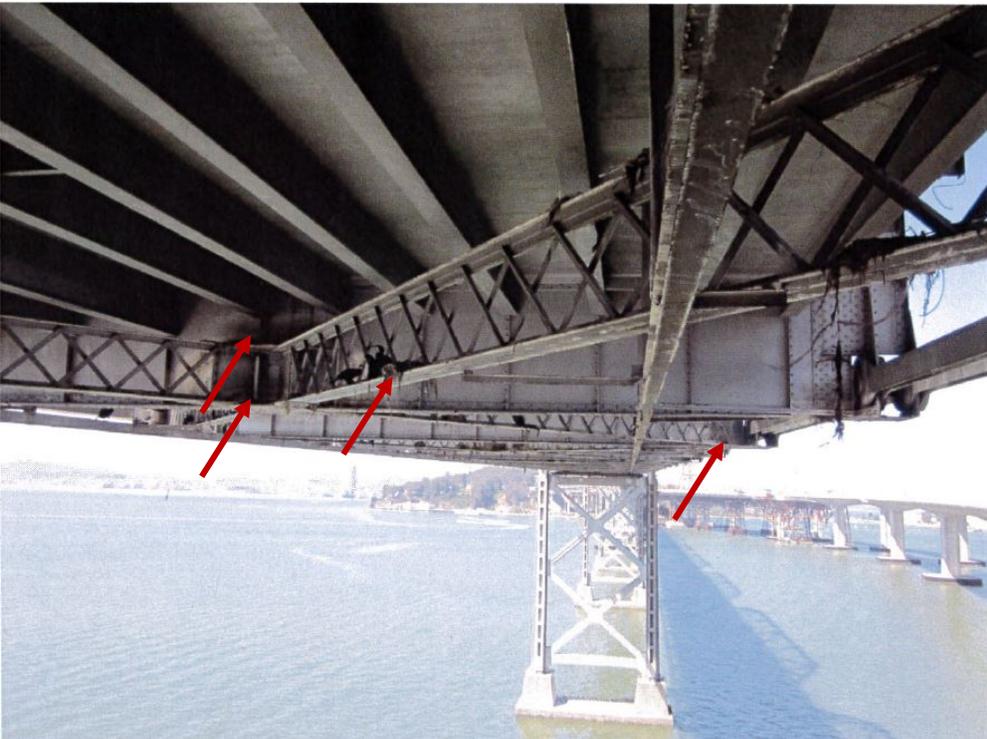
Double-crested cormorant nesting area west of Pier E9.
